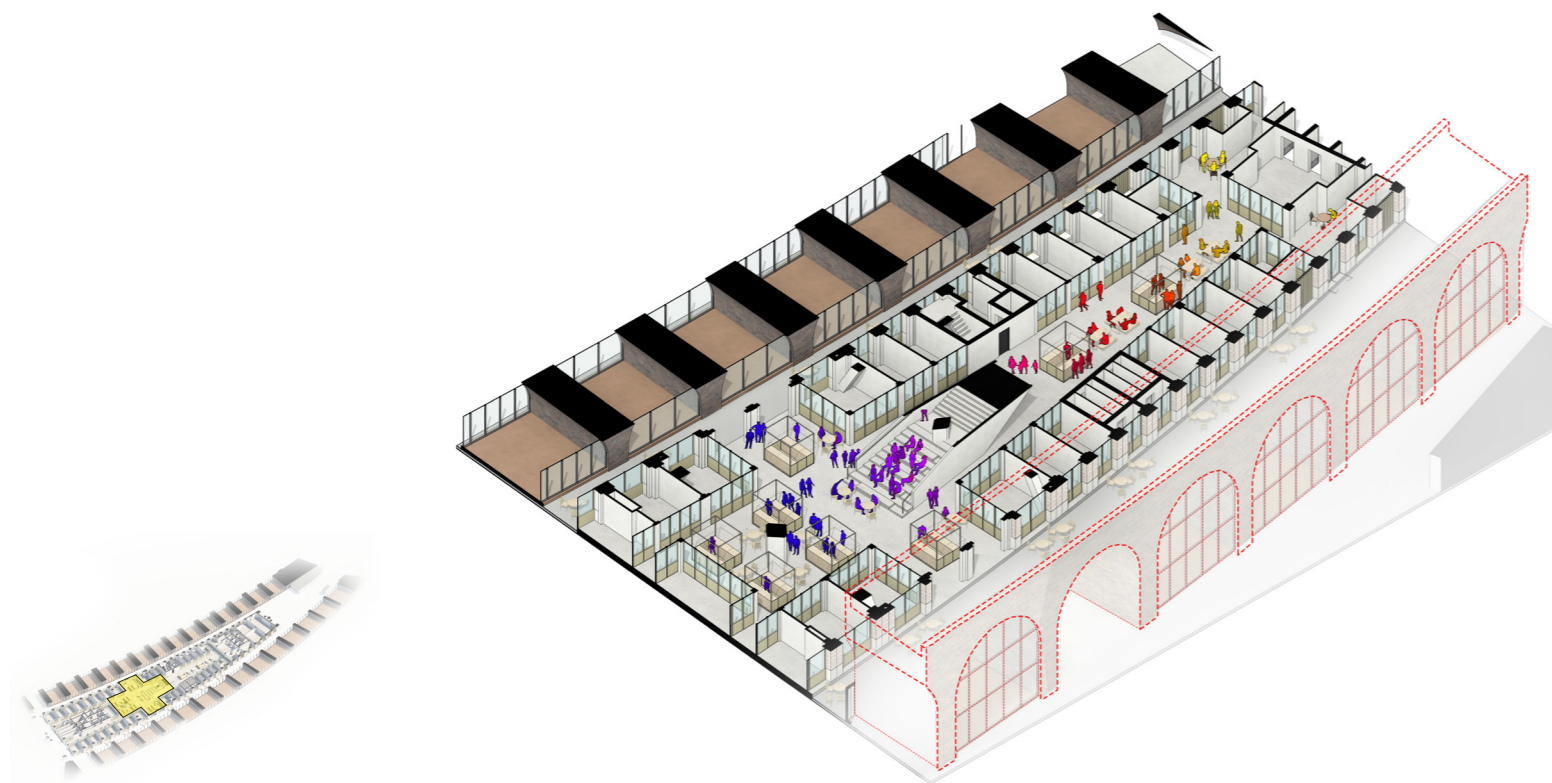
Publicly Accessible Open Space ground floor axonometric diagram
